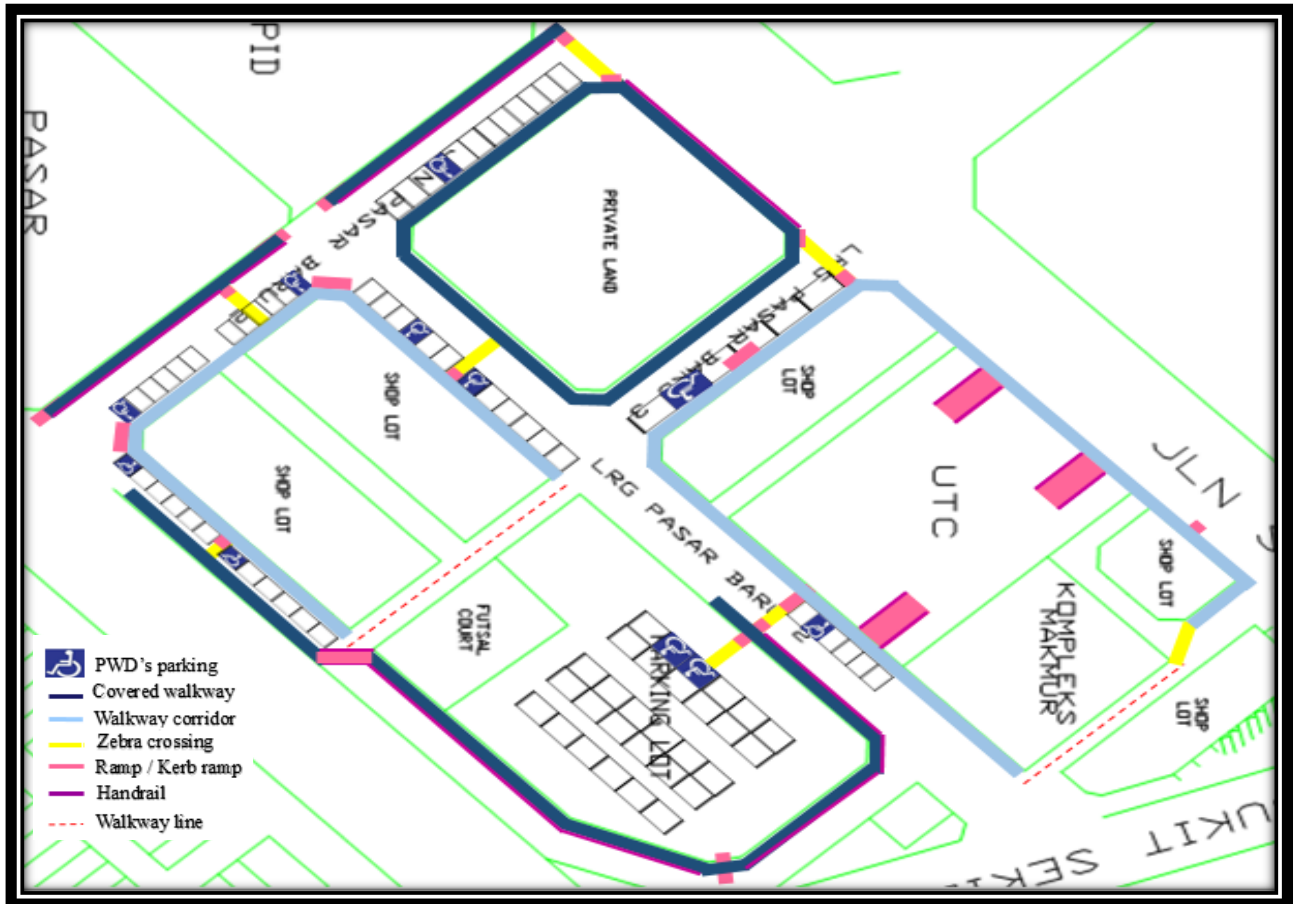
The new propose pedestrian facilities for wheelchair users
